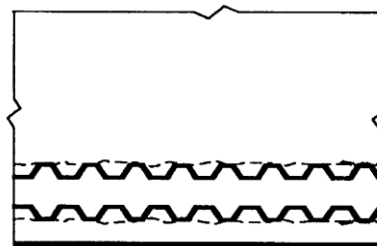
Side view of a reinforced concrete member showing shear cracking / local concrete crushing due to bar pullout
